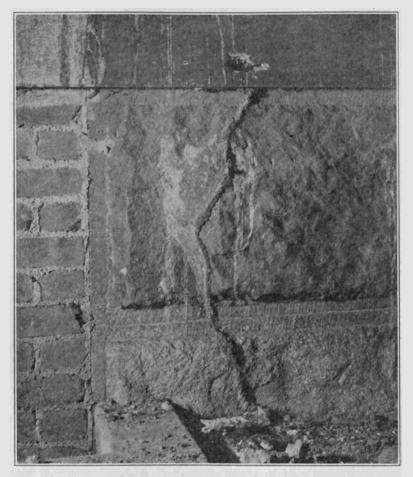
Termites constructed this shelter tube in a partly excavated area to gain entry to wood in this building.
